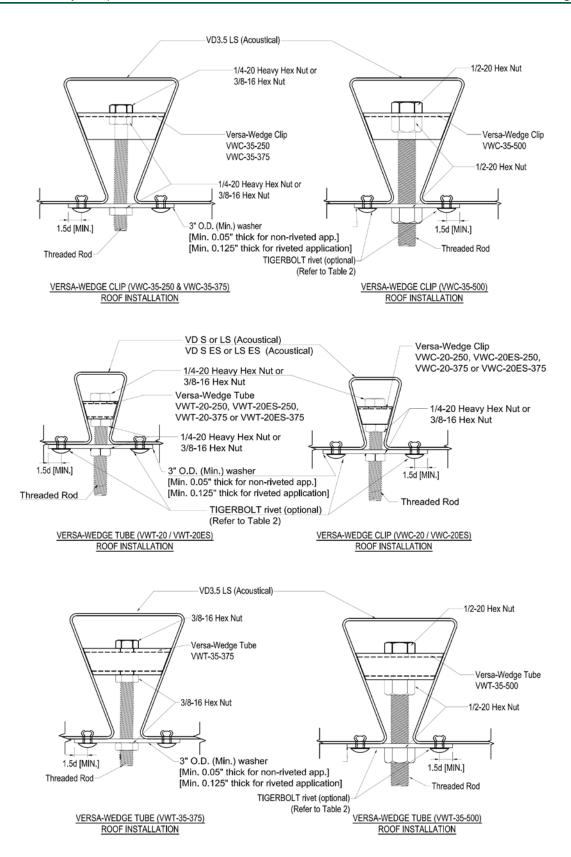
VWC AND VWT ROOF INSTALLATION DETAILS Note: Hex bolts not shown.
